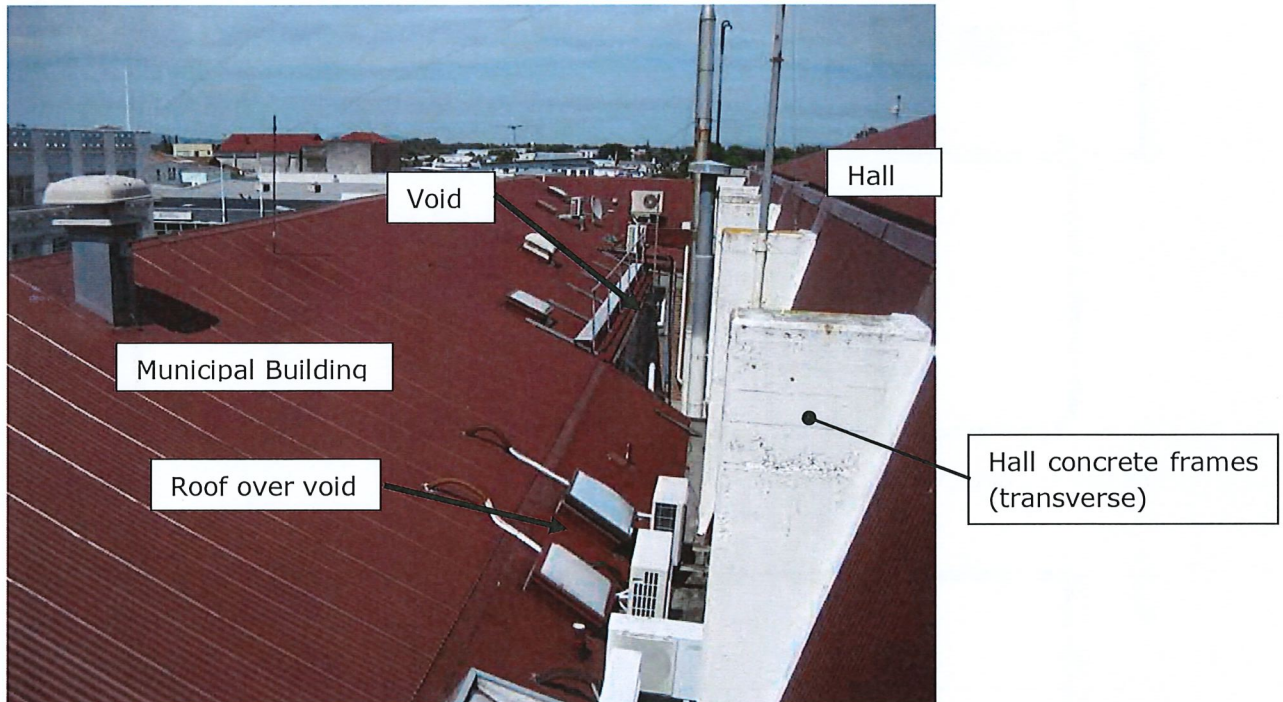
Roof Plan – note new roof bridging the gap between the Hall and Municipal Building
